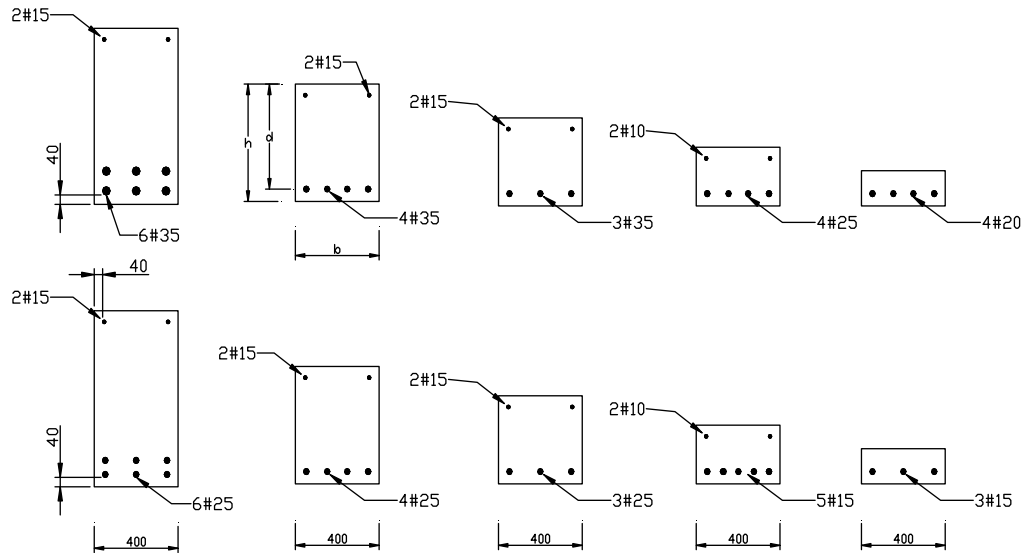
Cross sections and reinforcement layout of beams with 1% and 2% ρ_w (dimensions in mm).
